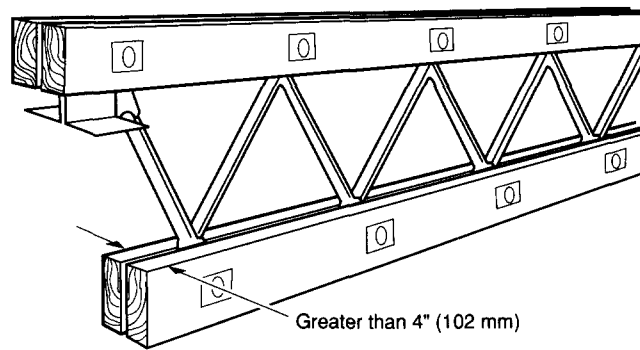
(b)(v) Examples of wood truss construction.
